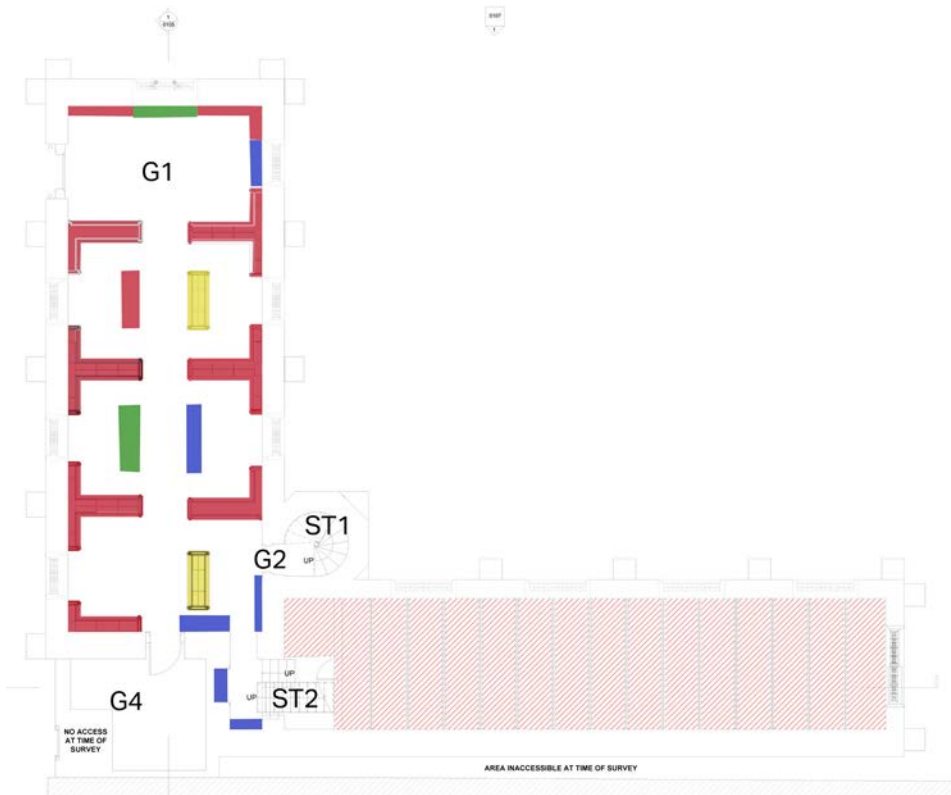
A ground floor plan showing the layout of Scott's original bookshelves and display case in red, 2019 (Donald Insall Associates)
